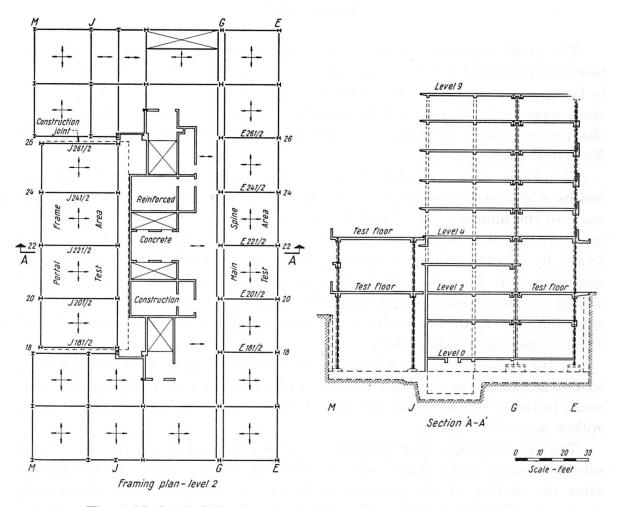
Mechanical Engineering Building Stage 1. Imperial College.
